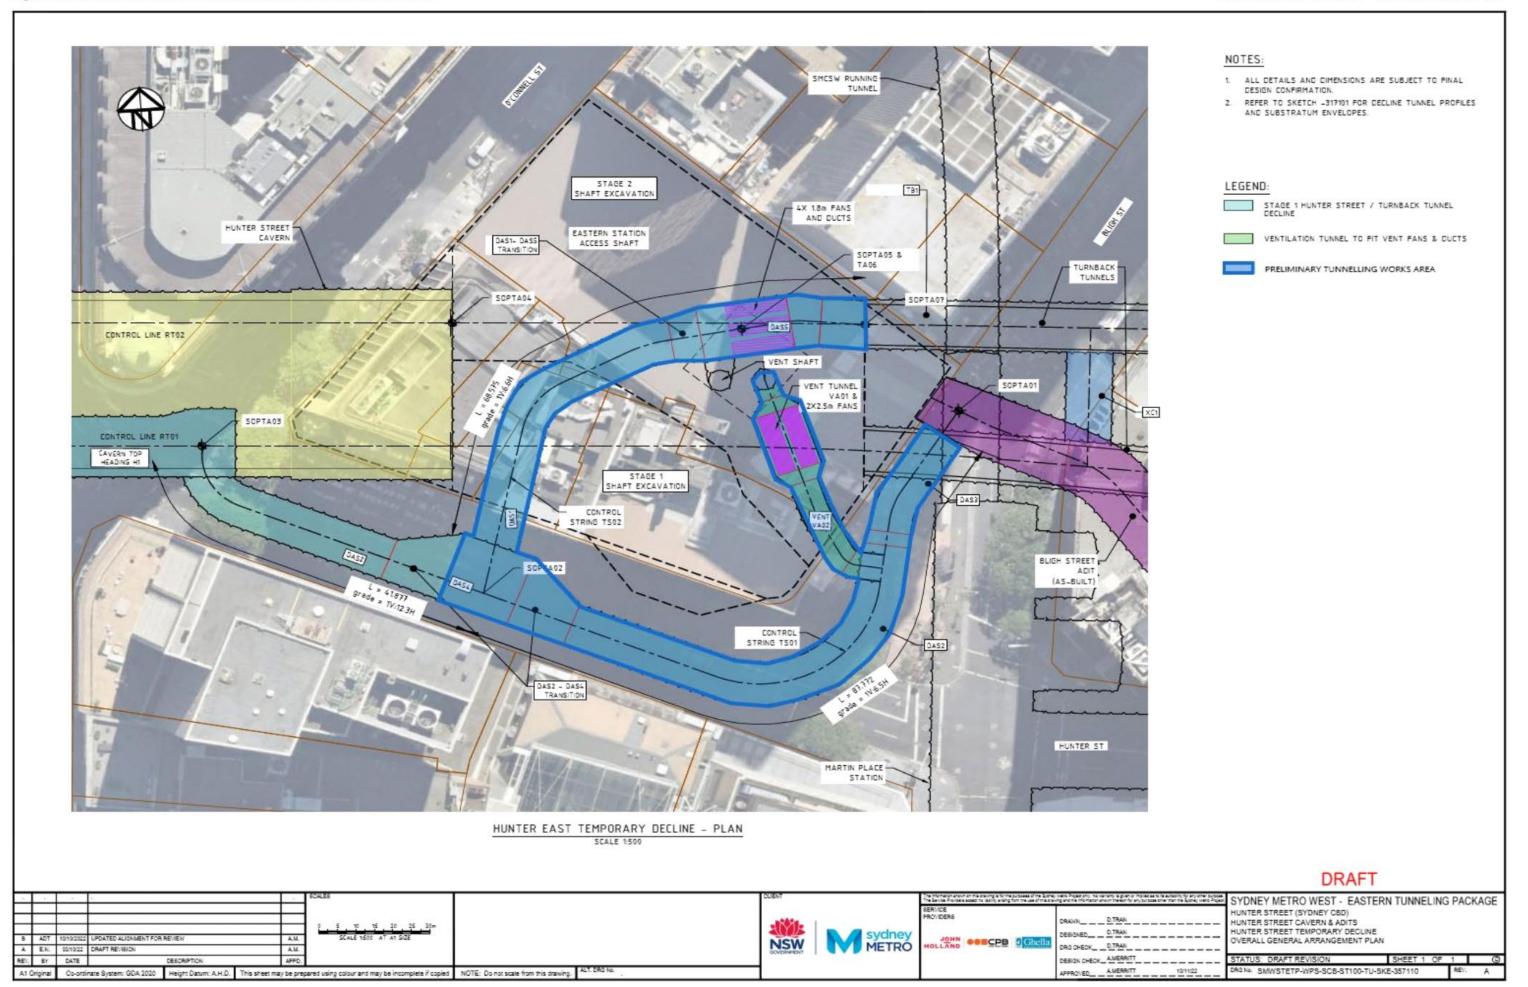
Decline Tunnels, Ventilation Ducts and Ventilation Adit
